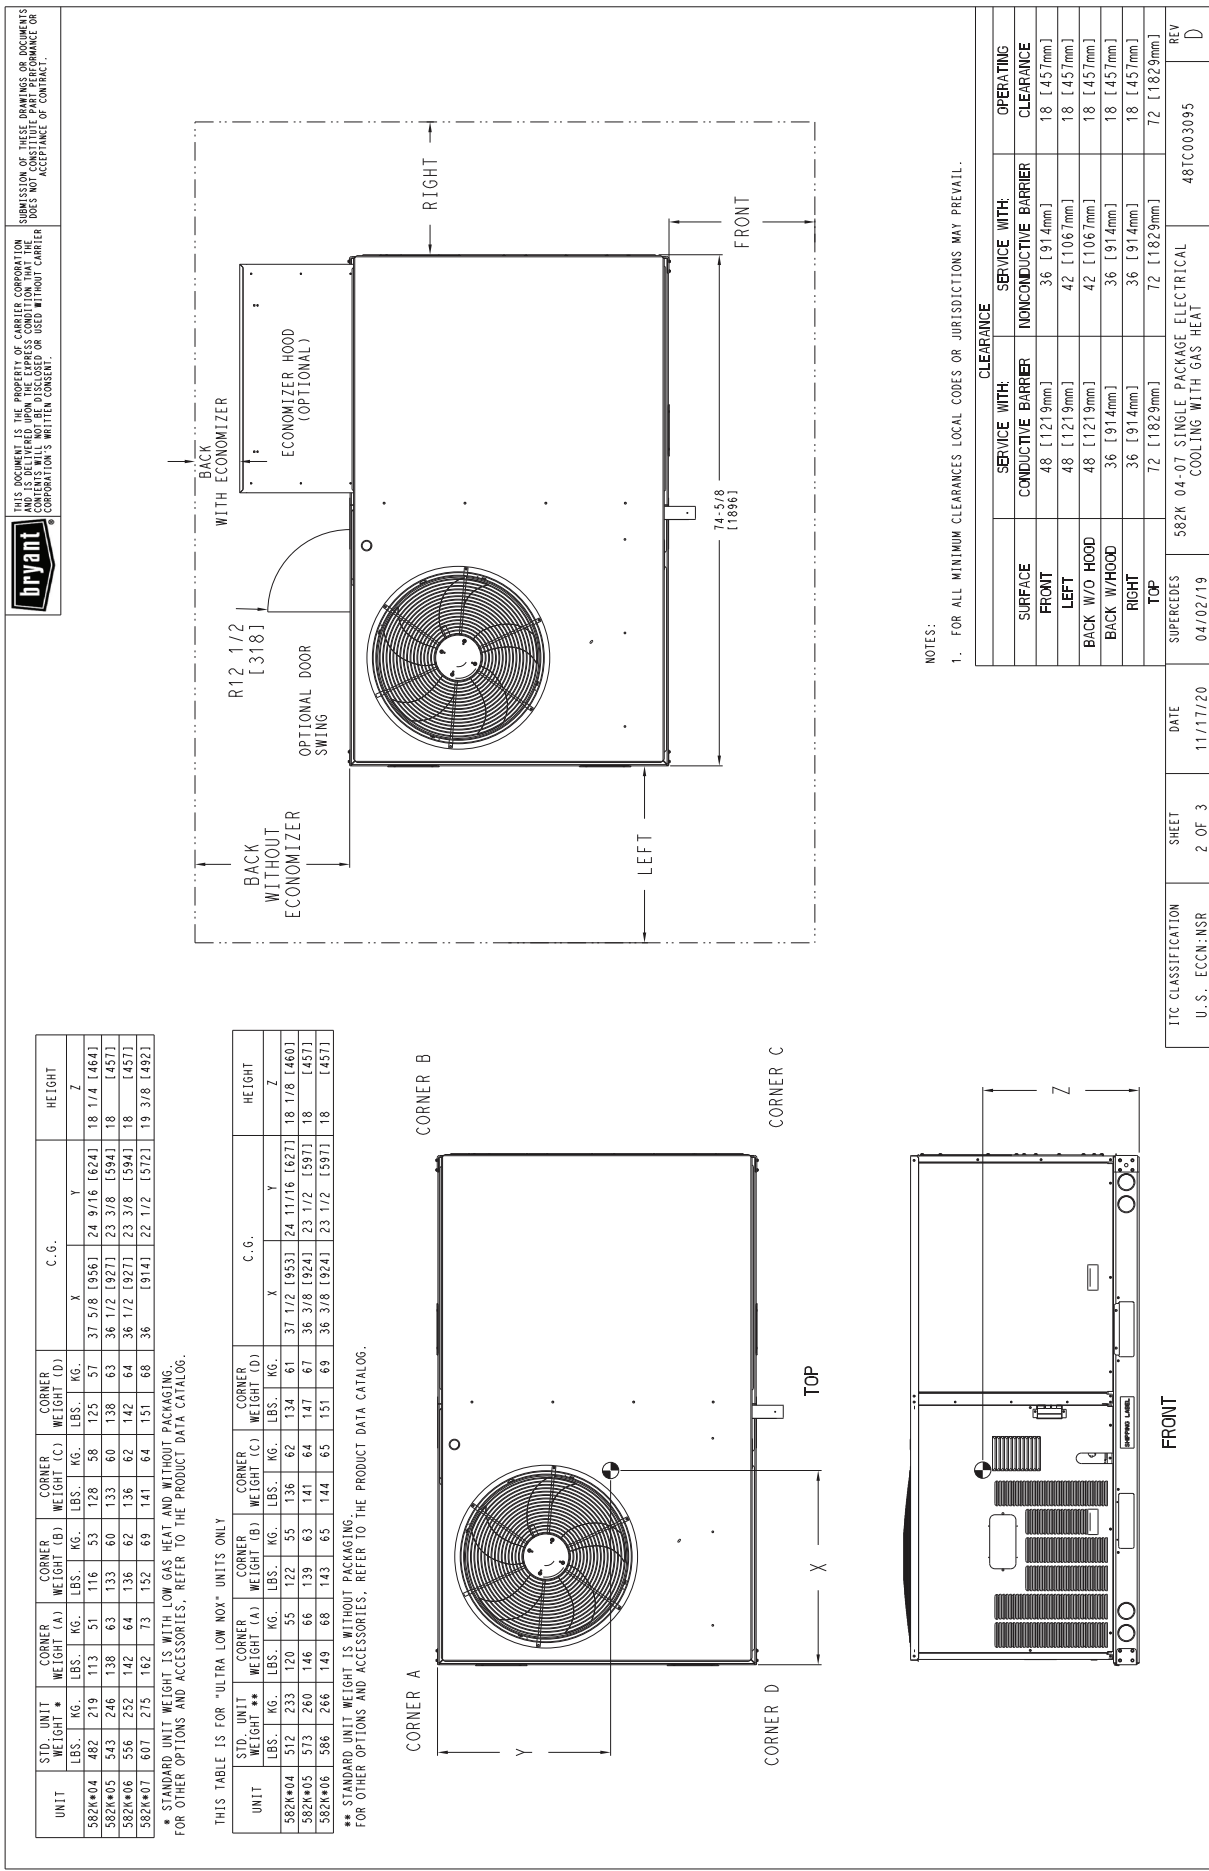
582K04-07 Dimensional Drawing (cont)
